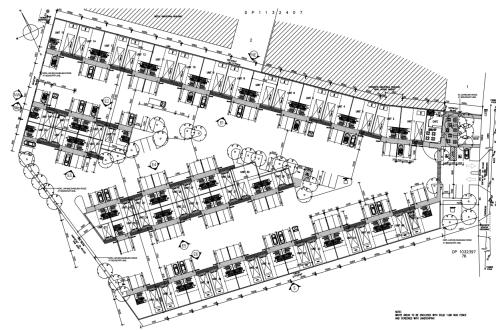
Site/ground floor plan of the proposed development (Note: the plan extract is from the latest revision, dated 21 July 2022).
